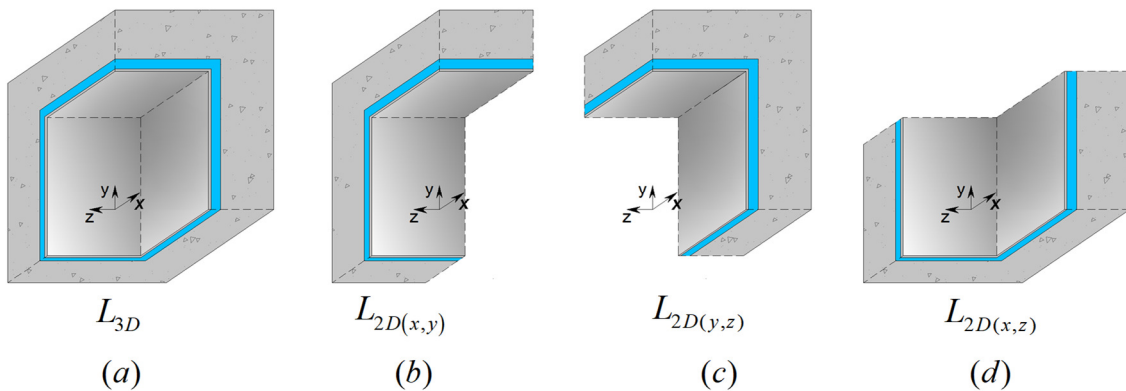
Three-dimensional building corner scheme separated into its two-dimensional components: a) 3D building corner; b) LTB – left wall to roof junction; c) LTB – right wall to roof junction; d) LTB – right wall to left wall junction.
